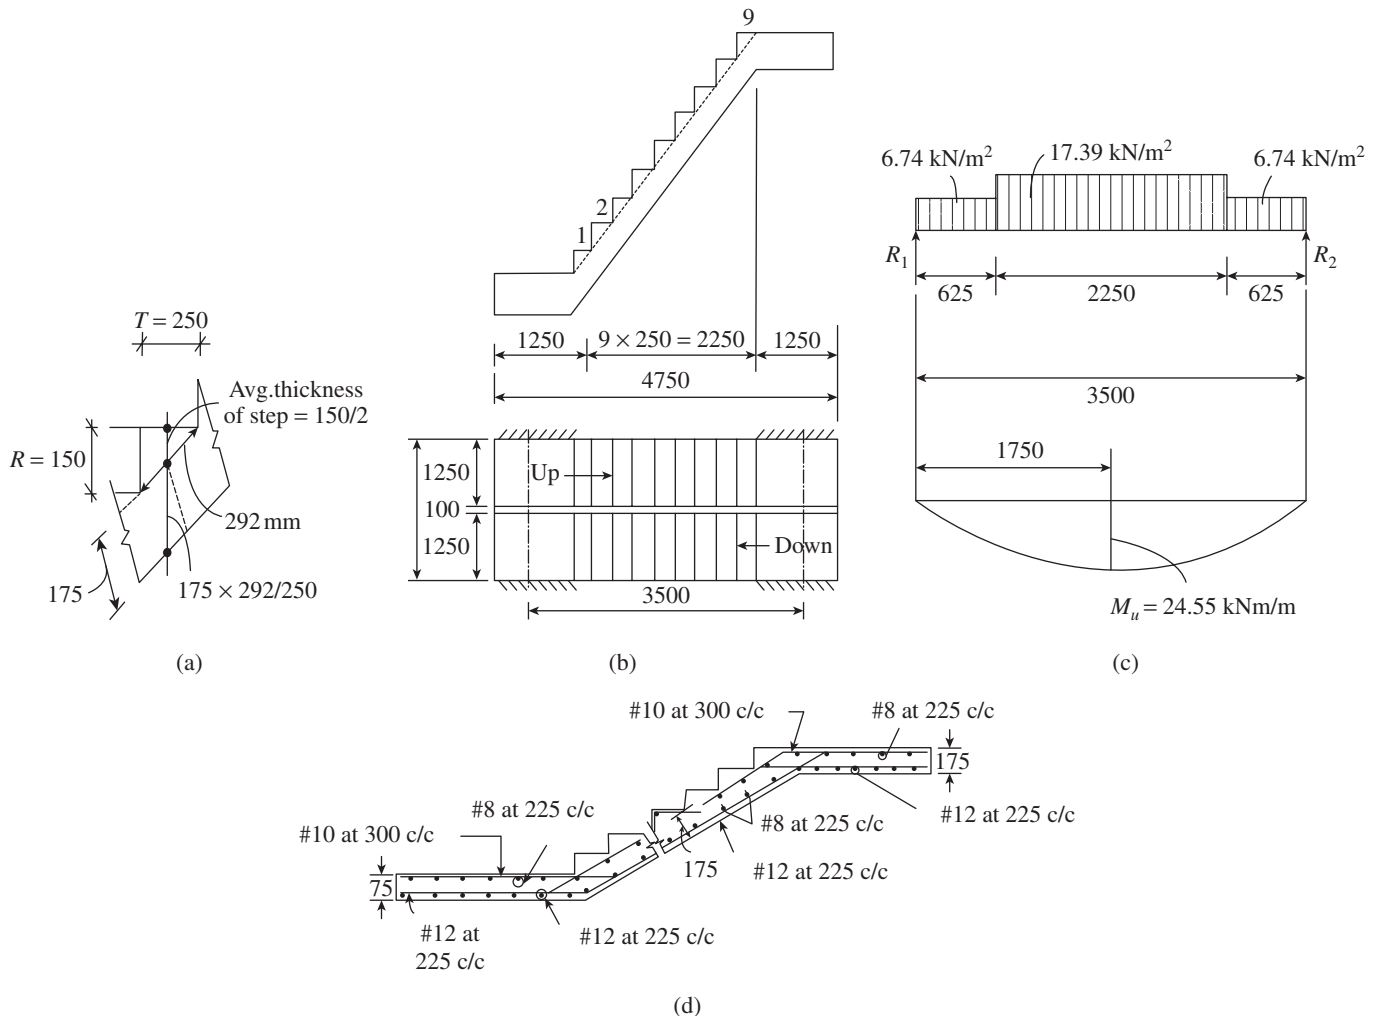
Dog-legged staircase of Example 17.7 (a) Steps (b) Stair (c) Loading (d) Detailing
